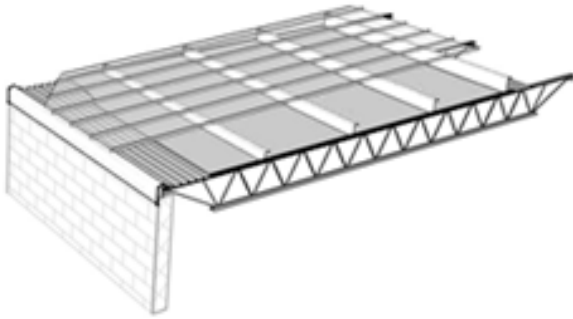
L: Low-slope framing system, parallel application over existing flat roof (existing bar Joist system shown) (Courtesy Metal Sales Manufacturing)
